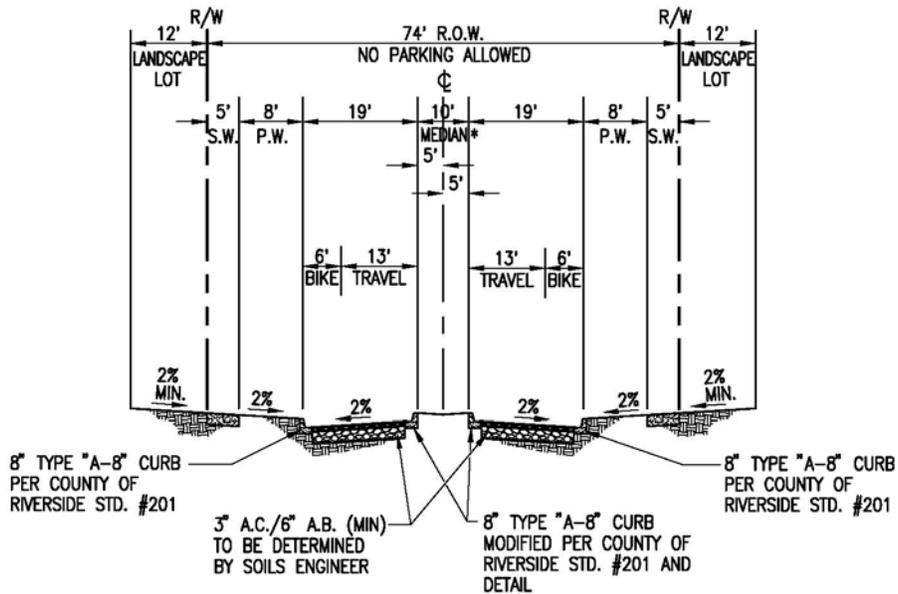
Summerly Modified Neighborhood Street Cross-Section
